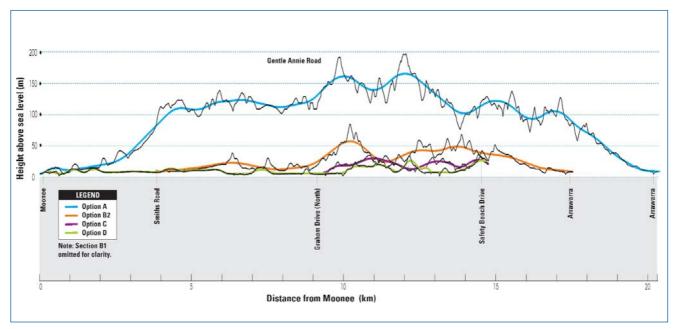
Longitudinal Sections (Profiles) Showing Heights of Route Options
